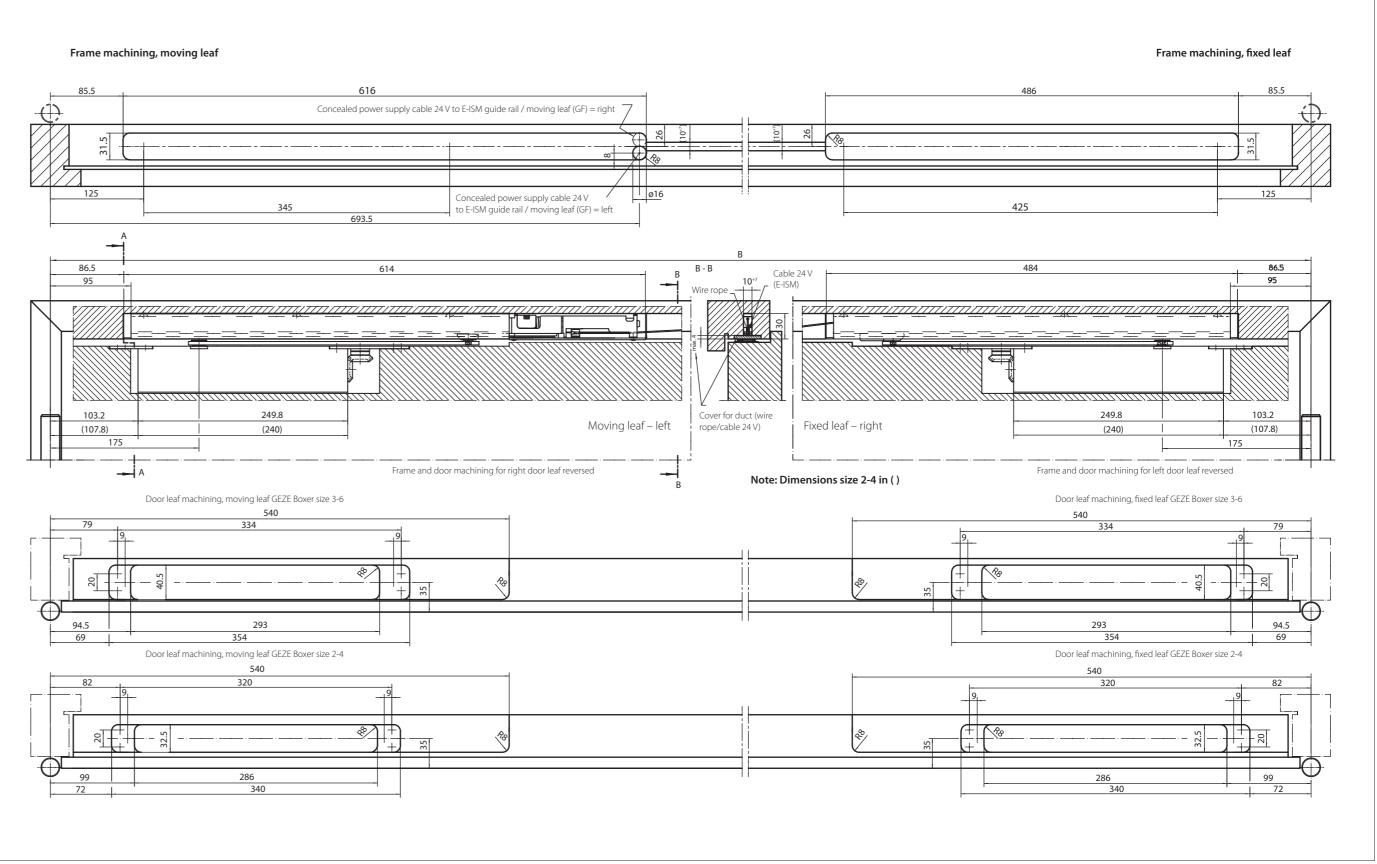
· ISM/E-ISM guide rail Boxer size 2-4/3-6, rebated timber door
